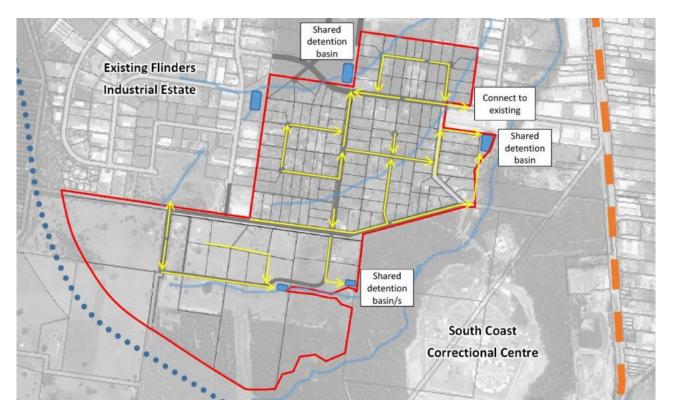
Drainage Concept Plan for Proposed South Nowra Industrial Development
